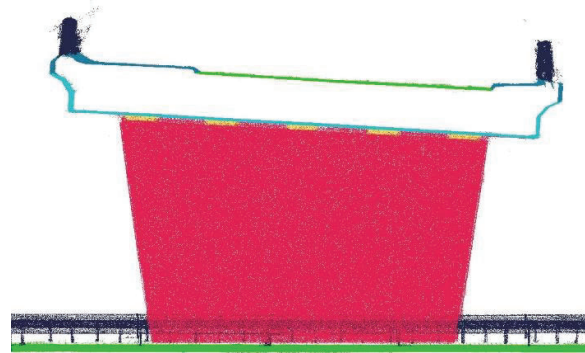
Cross-section of the semantic segmented point cloud of bridge 2
